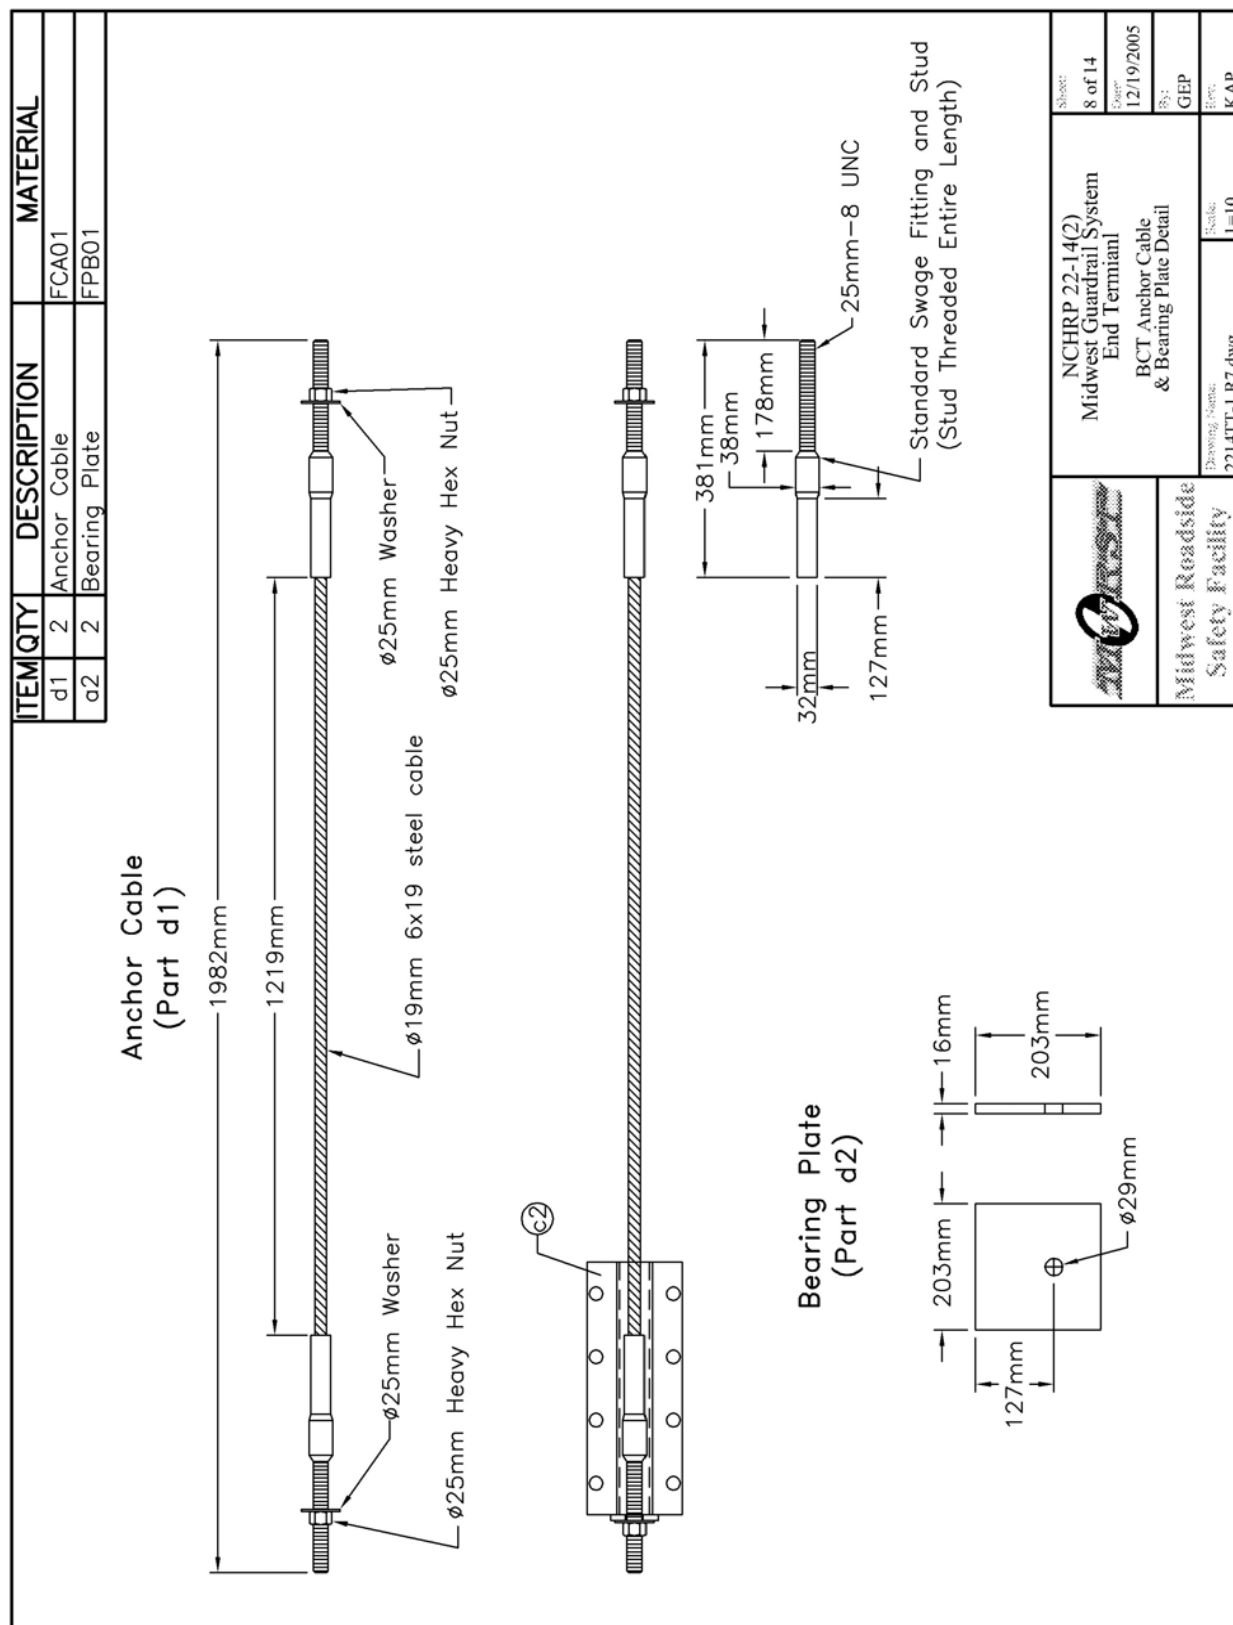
Midwest Guardrail System End Terminal - Anchorage Details
